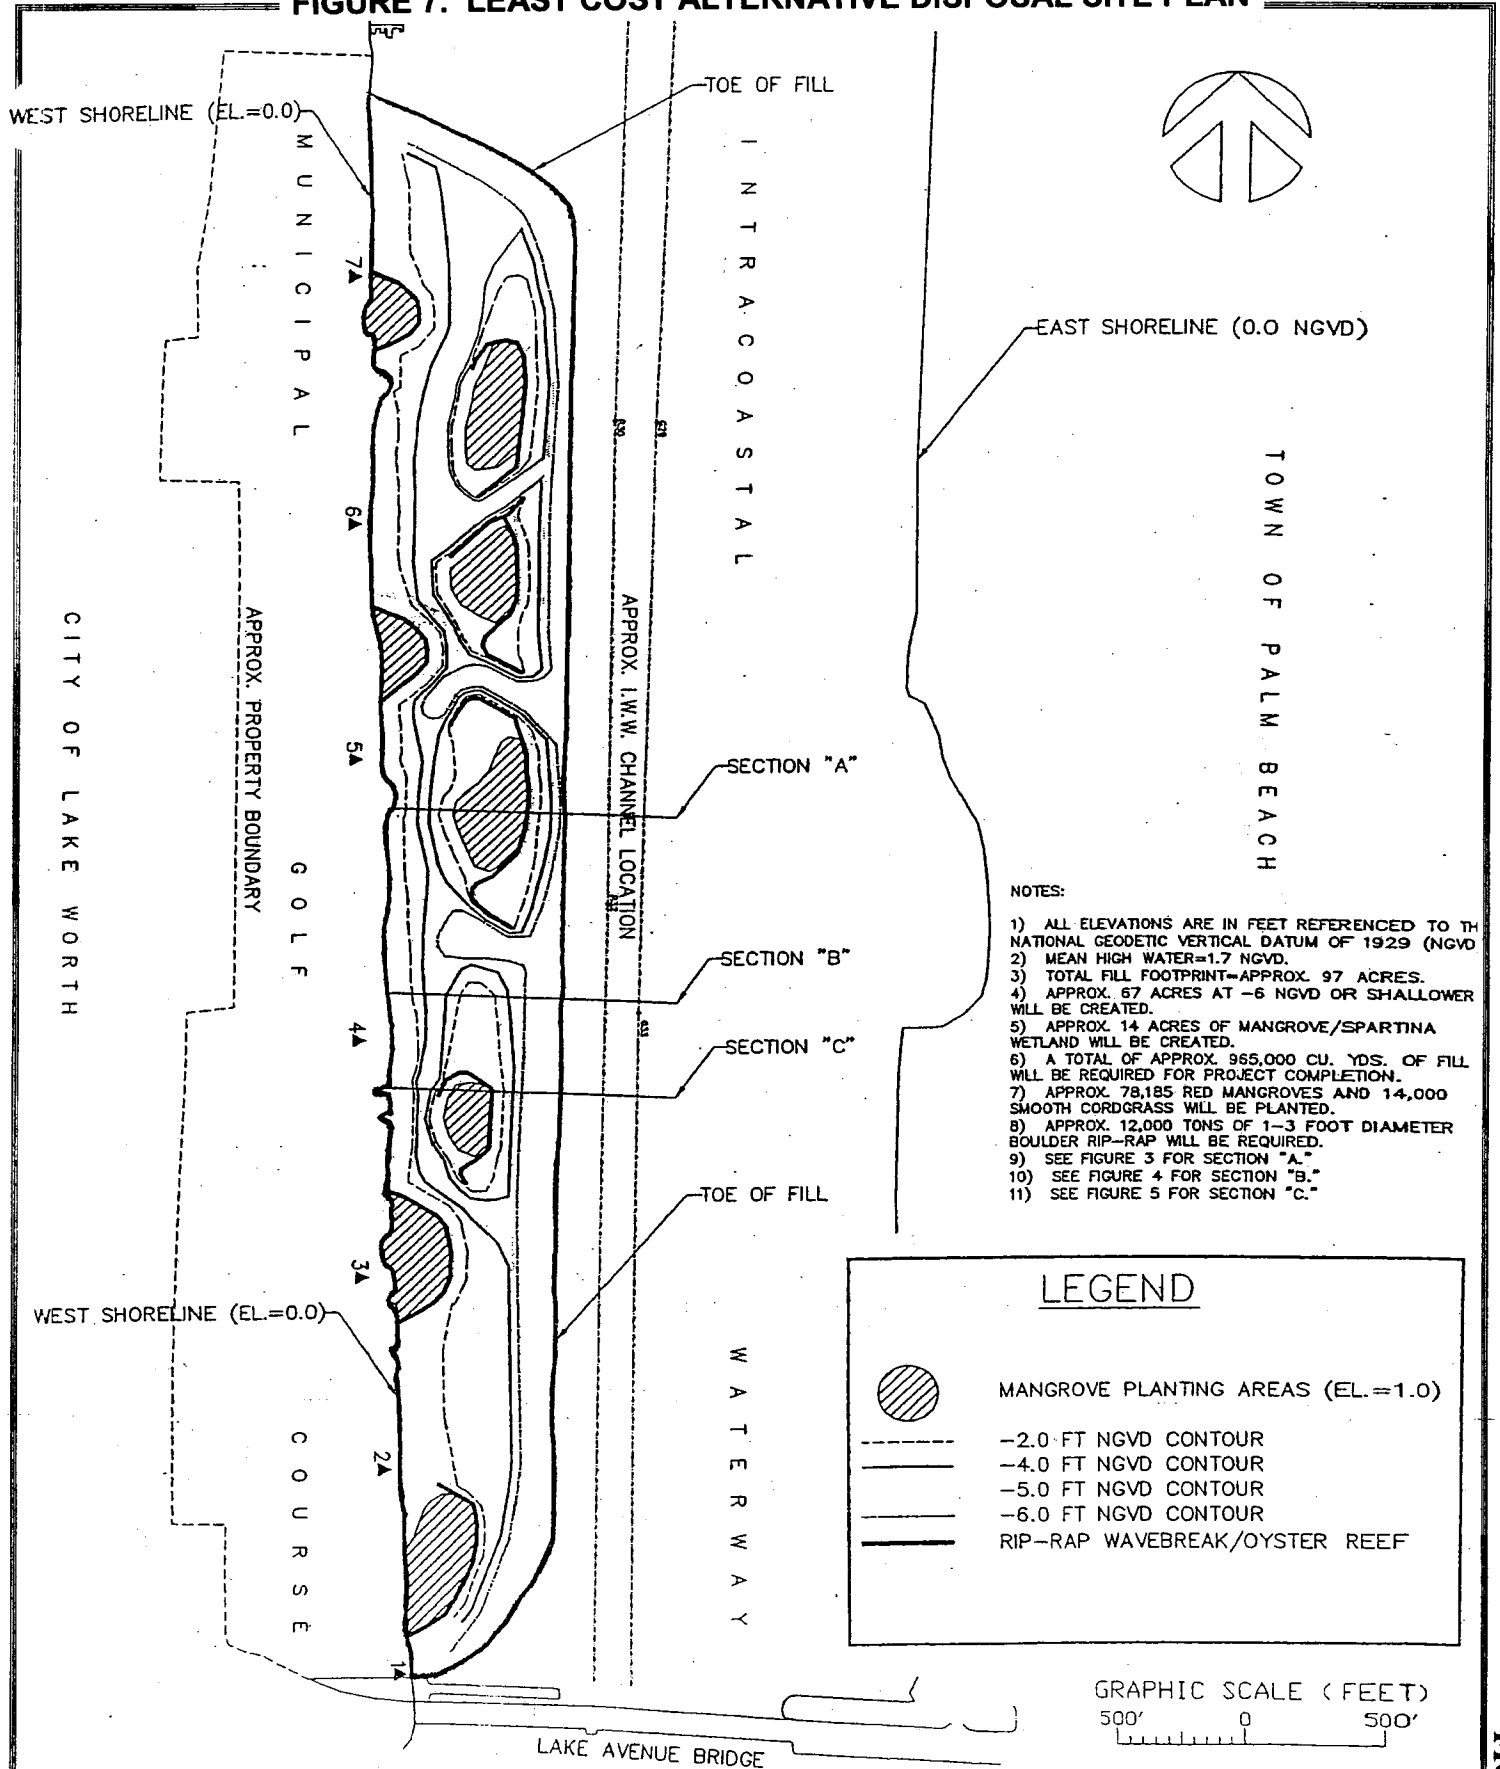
LEAST COST ALTERNATIVE DISPOSAL SITE PLAN
